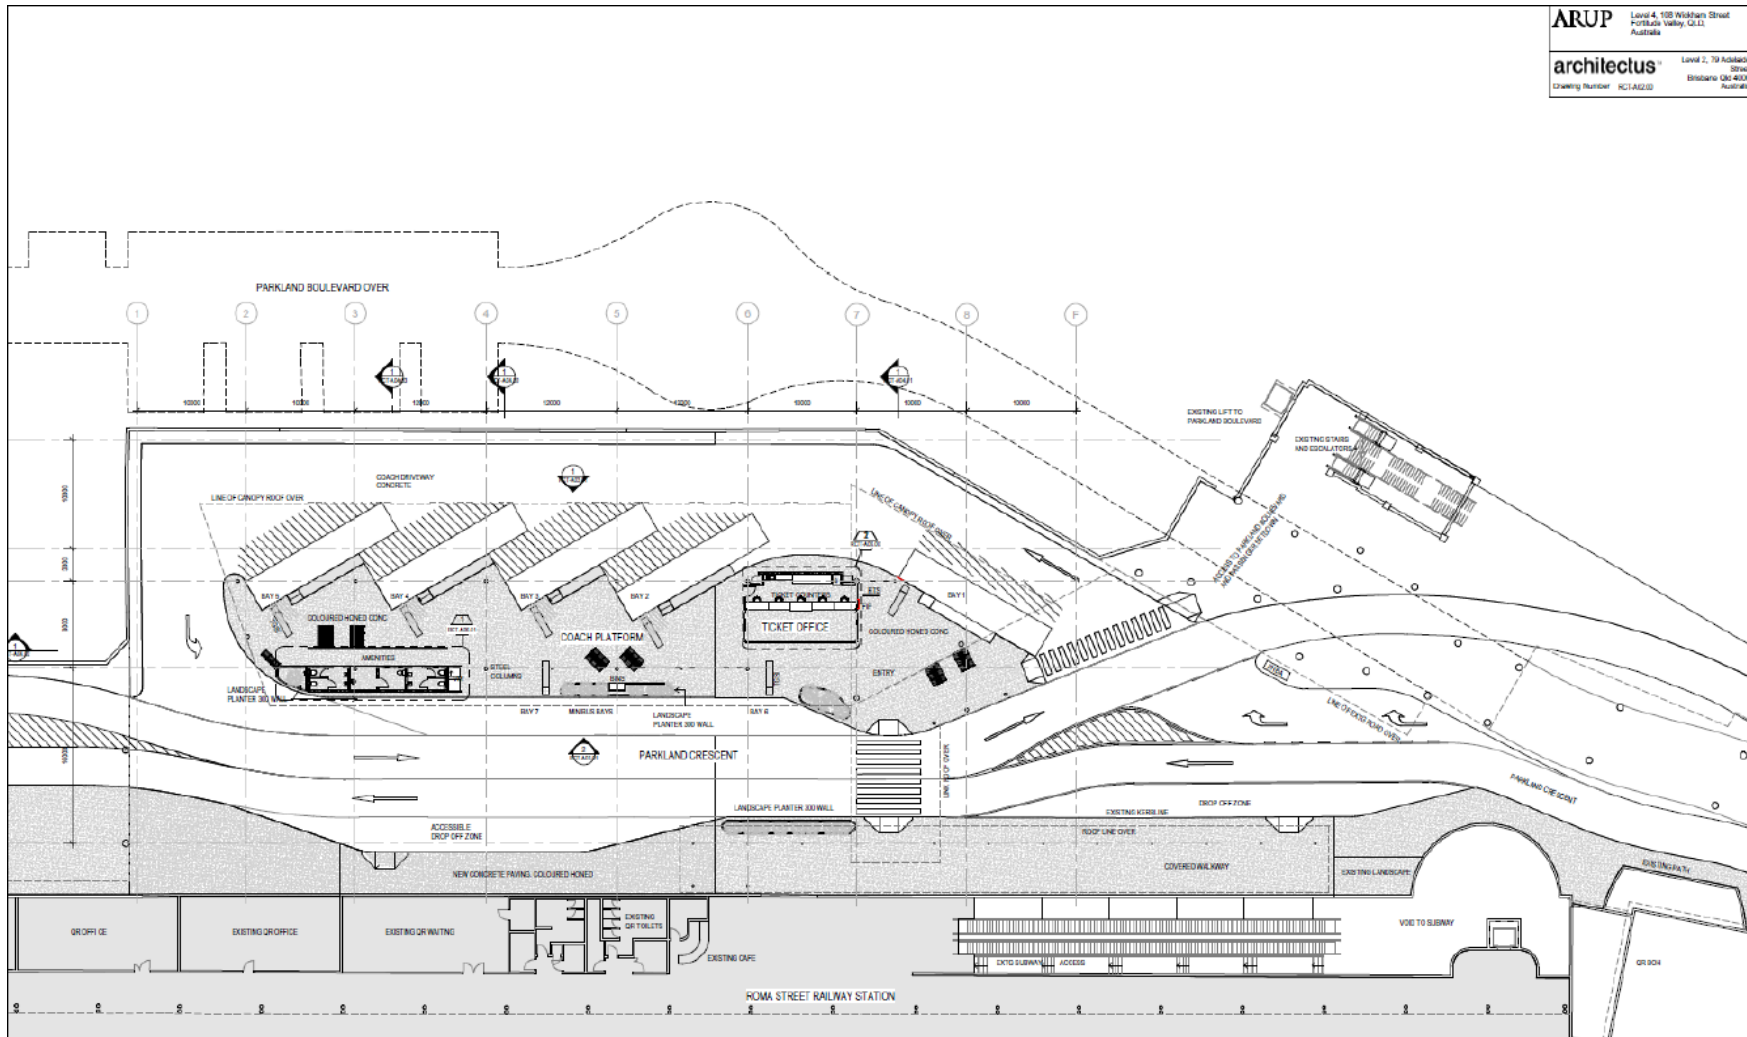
Proposed temporary coach terminal concept design site plan ground level (Source: June 2018 project change application)
